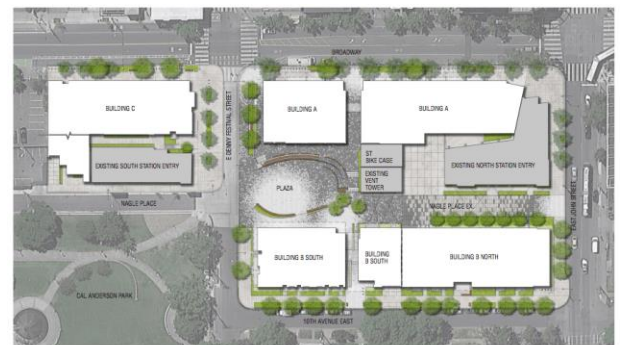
Site Plan for the Capitol Hill Light Rail Station TOD as proposed by Sound Transit.
